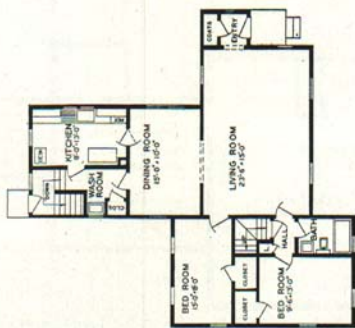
The remodeled house plan of Fig. 23. Note the convenient kitchen arrangement.
